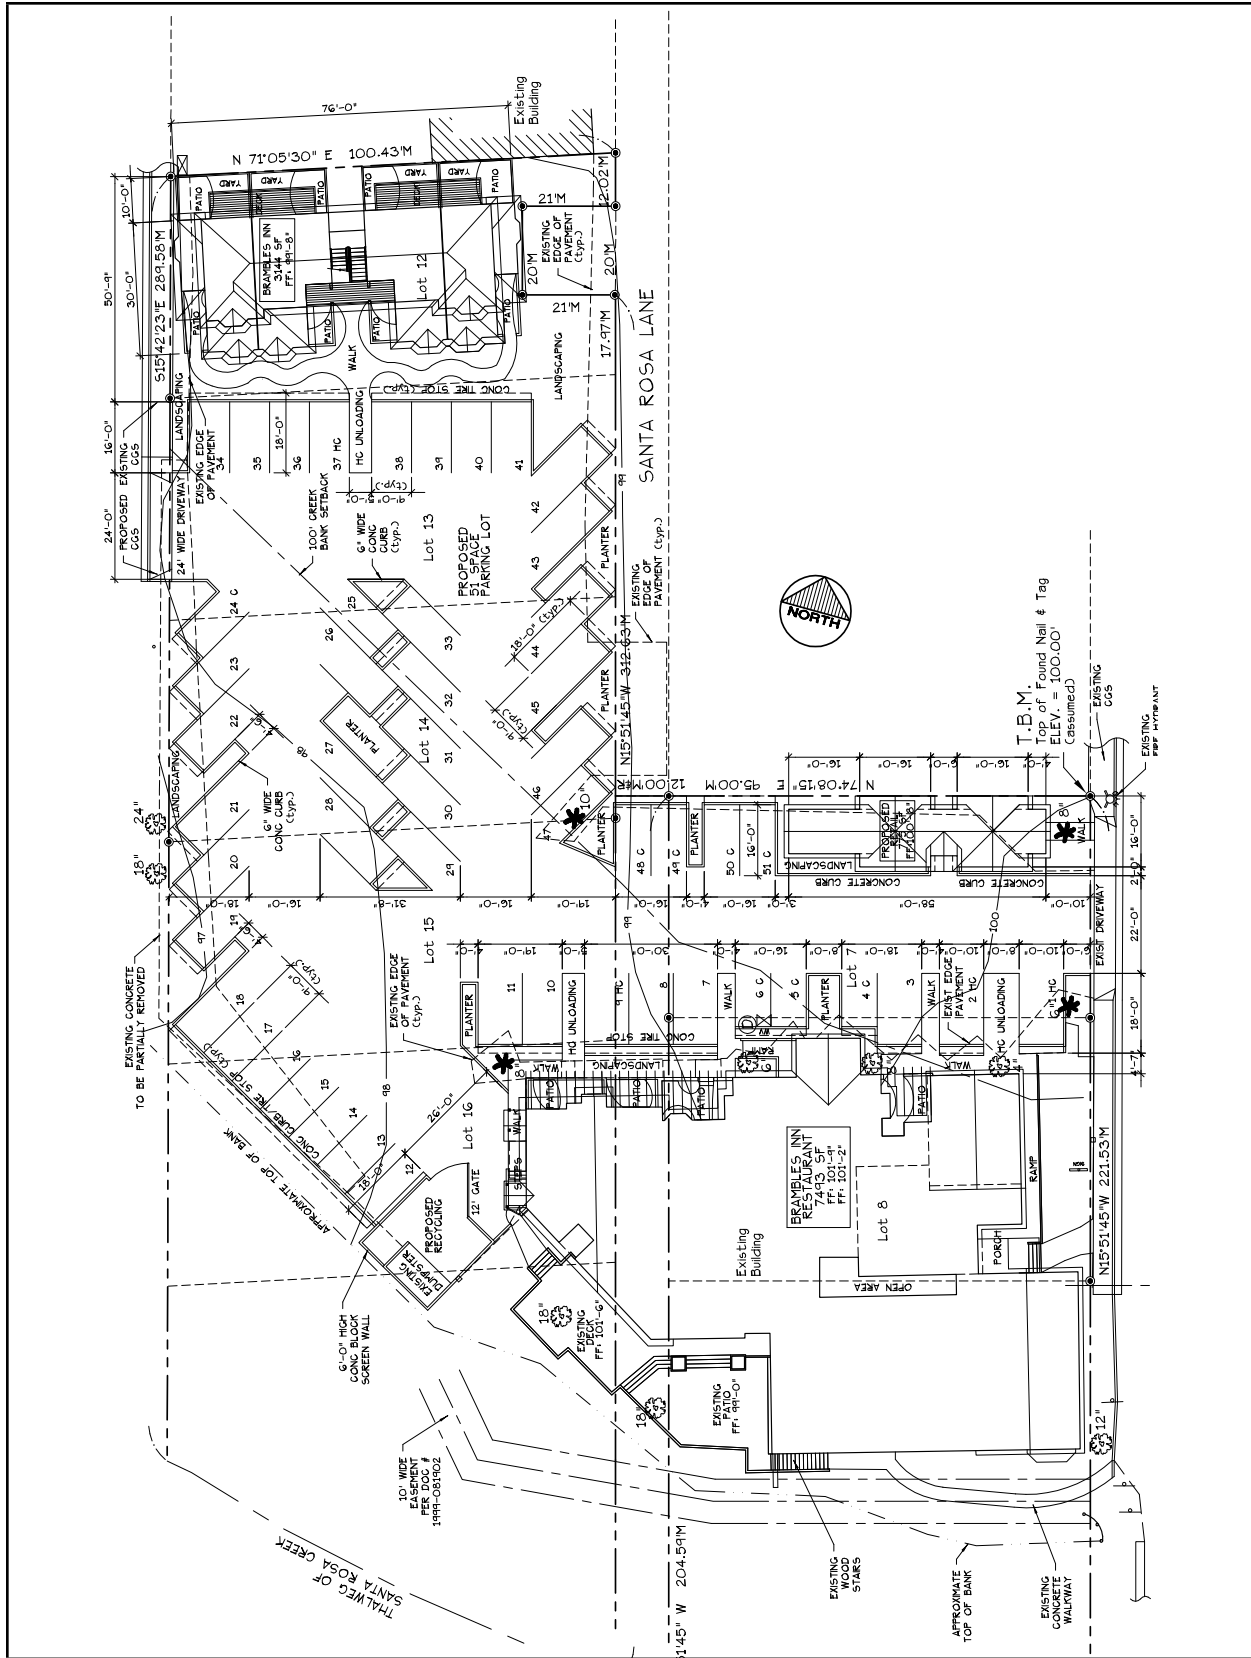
Proposed Alteration To The Existing Structure & Surroundings
